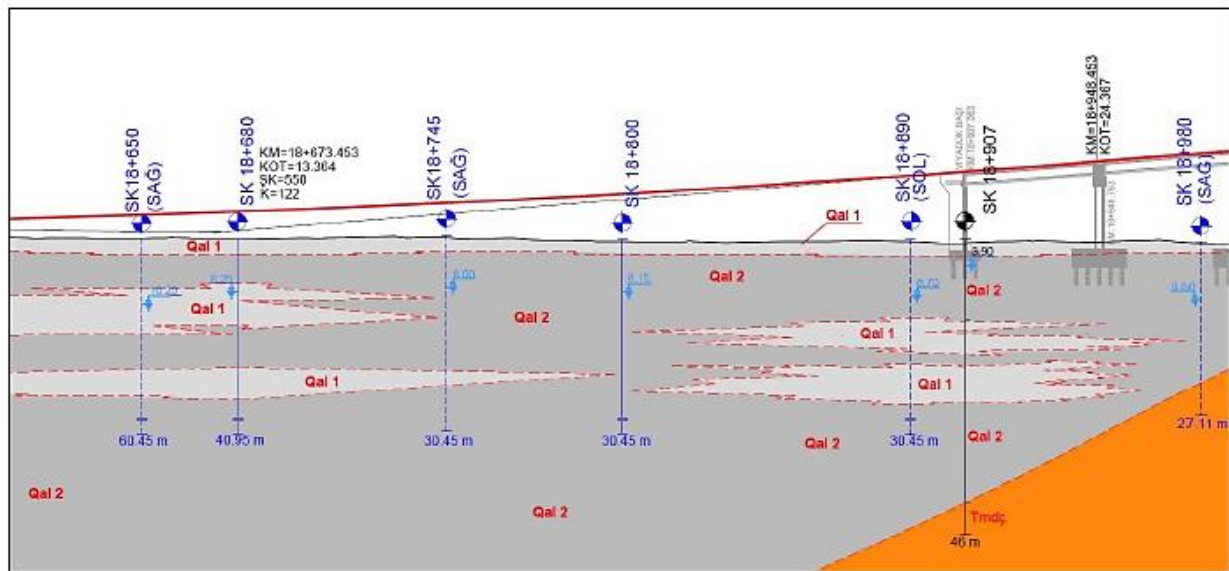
Soil profile at bridge approach between Belen bridge and main canal bridge
